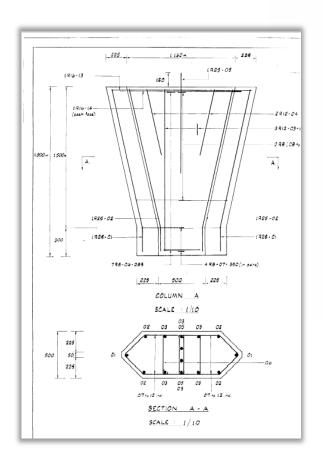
A.16.9. Extract from County Council bridge drawing showing support structure. (See Appendix for more details).
